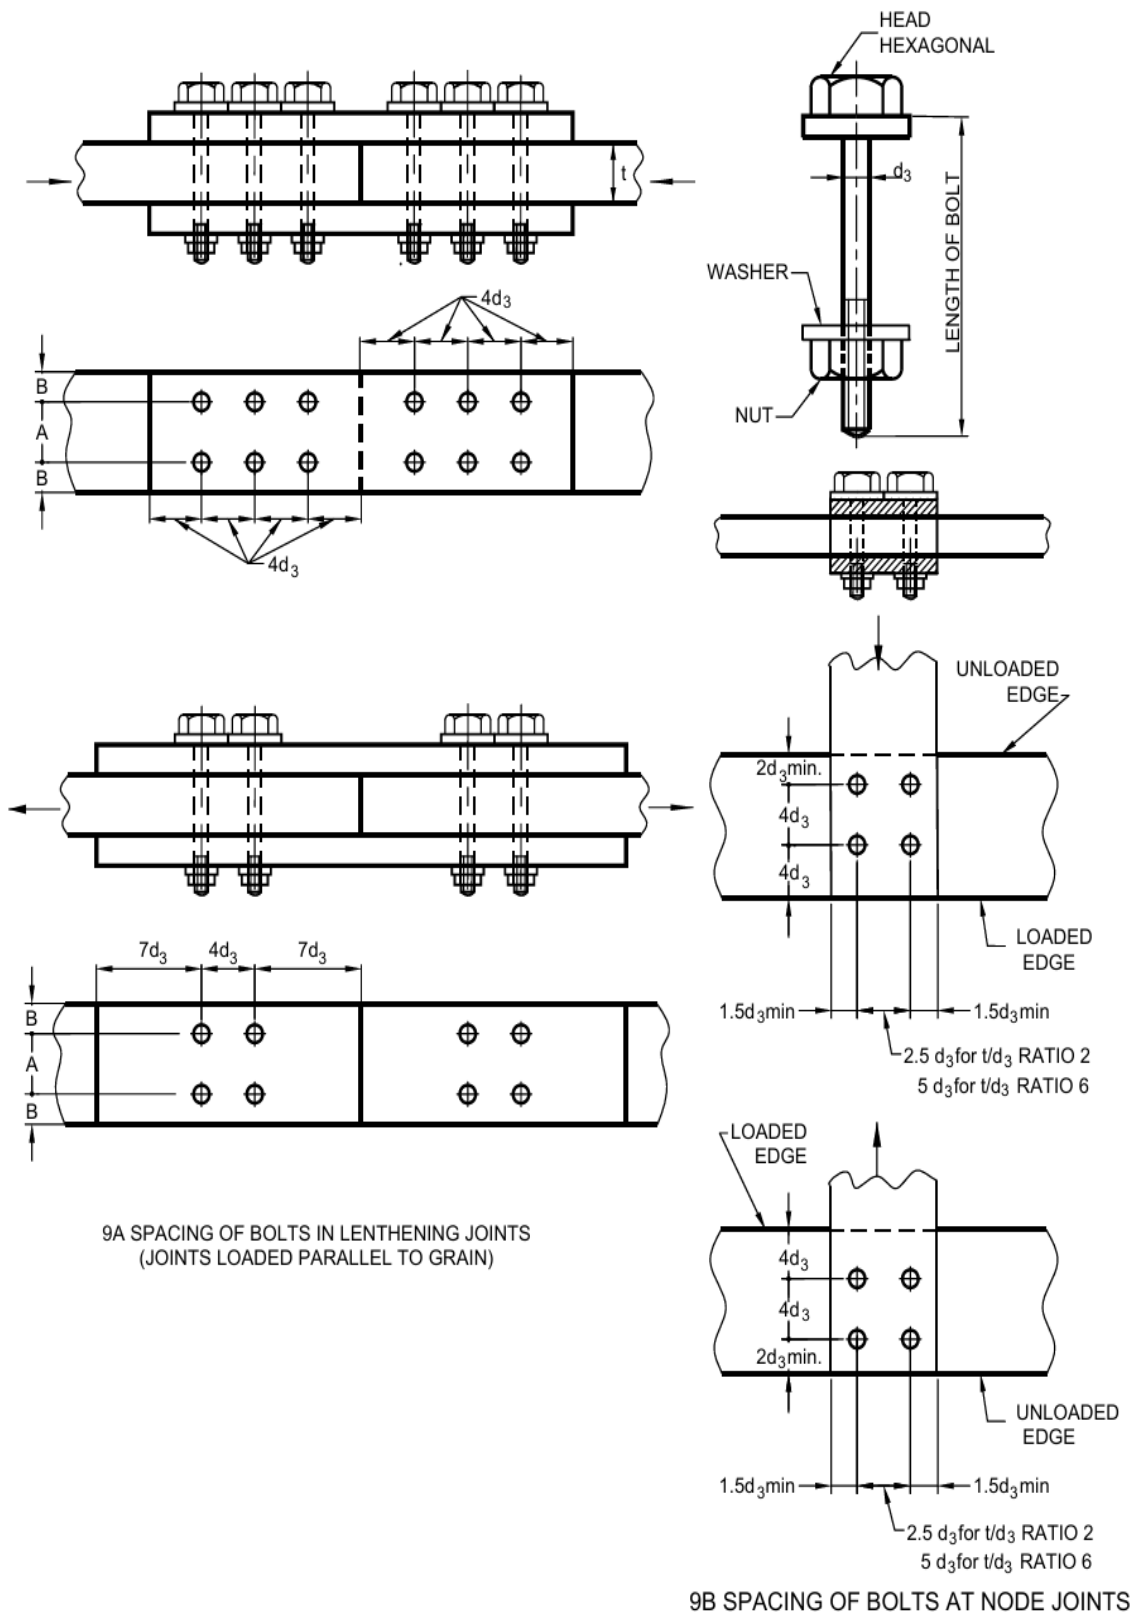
TYPICAL SPACING OF BOLTS IN STRUCTURAL JOINTS
